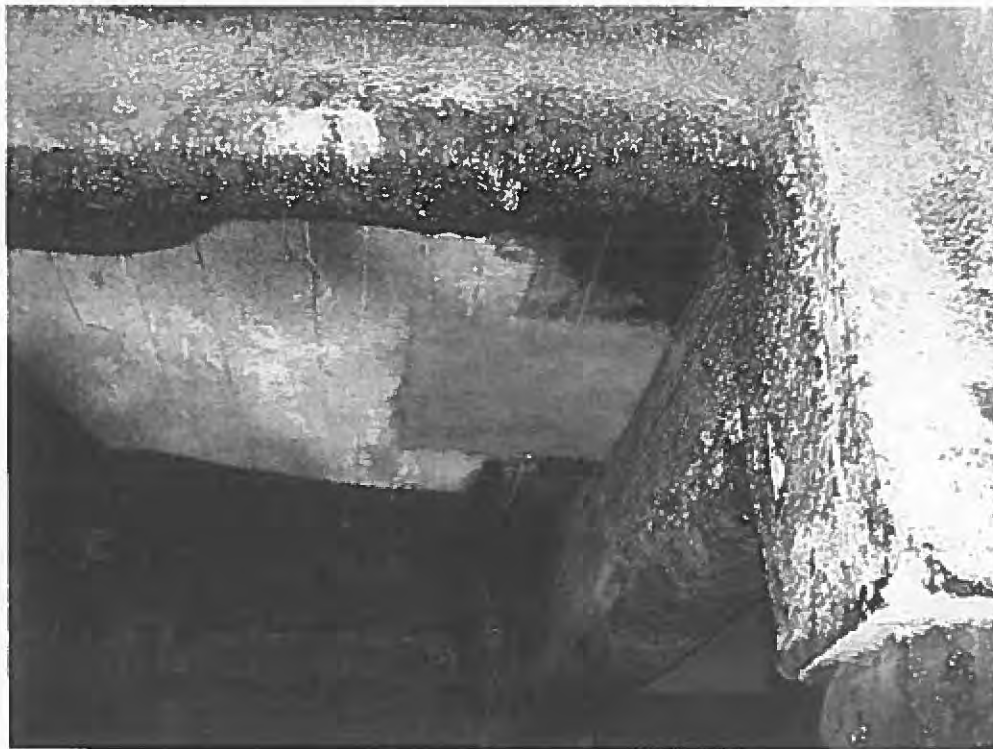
Typical Slab Patch Repair (5/14/2019)
